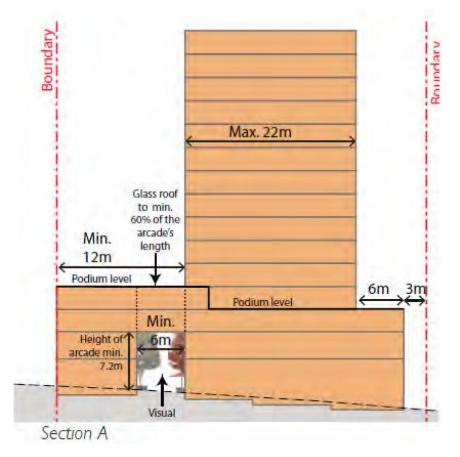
East-West Section of Site Building Envelope
